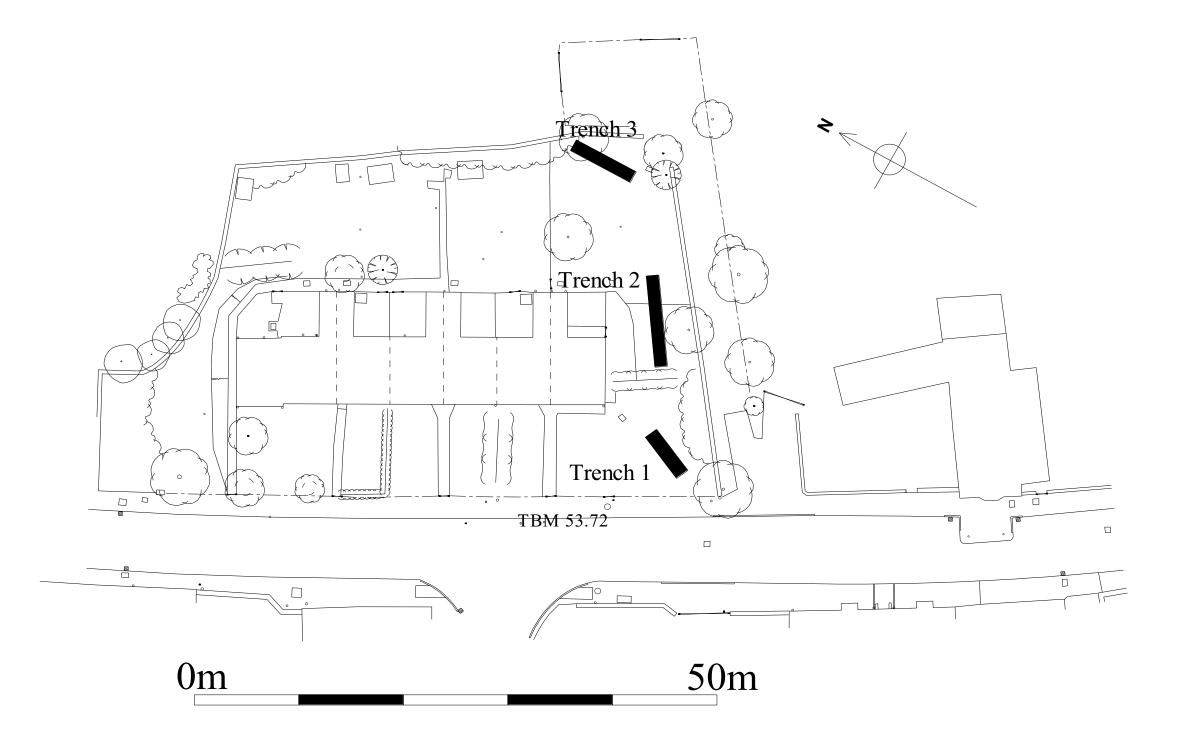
Trench Location Plan (Overlaid Drawing Supplied By David Todd Architecture).
